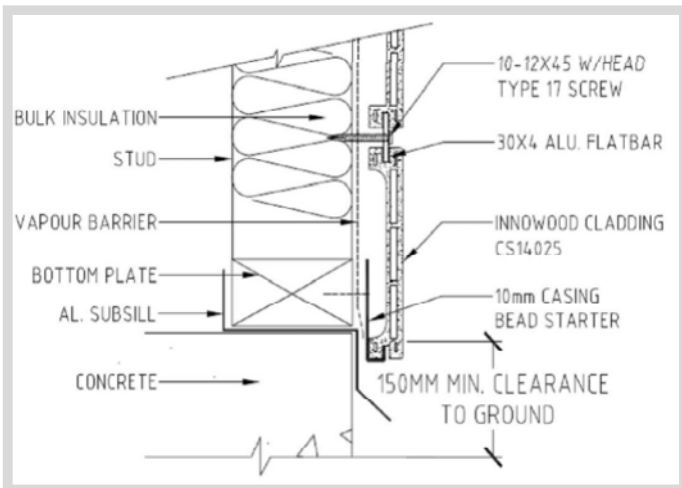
; Typical Cladding Detail – Concrete Floor Construction
